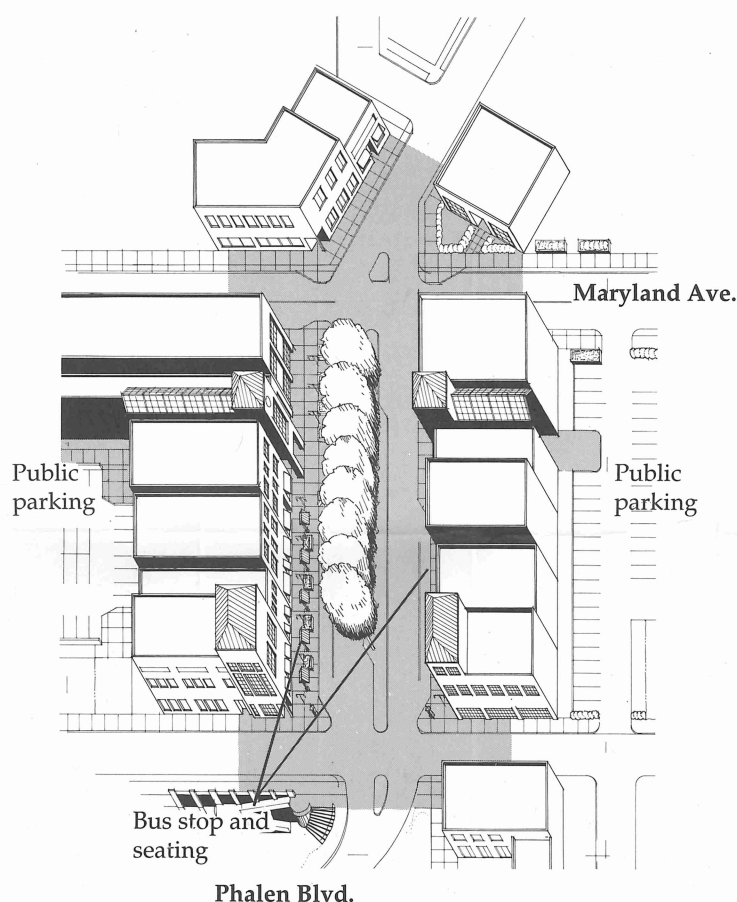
The transit "room" (right) is a pedestrian space on the street with continuous store frontage, wide sidewalks, lighting, window canopies, seats for resting, bus pulloffs, tree canopy, connections to parking, and second floor business and residential uses.
